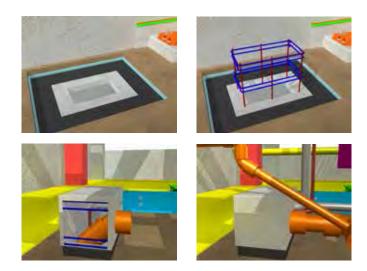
Plumbing connection between the Orchid House and existing building in Taipei
